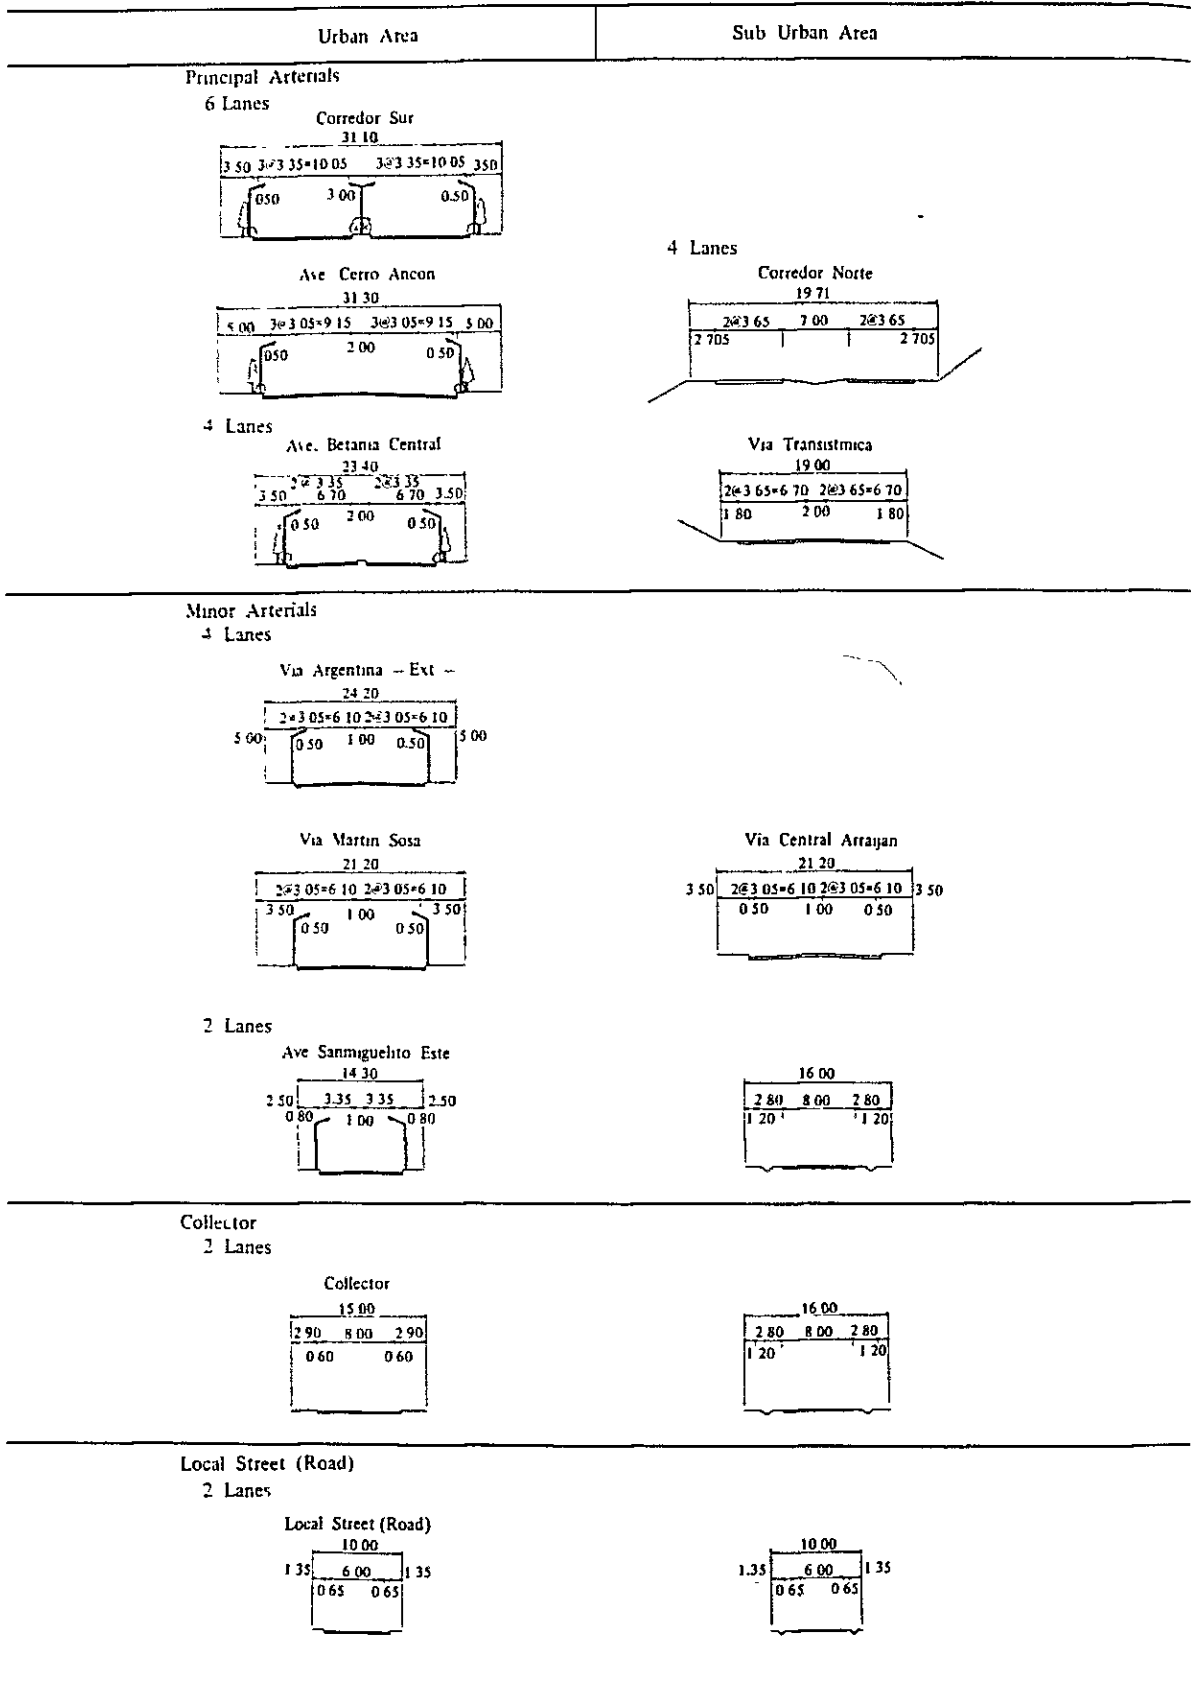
STANDARD ROAD CROSS SECTIONS
